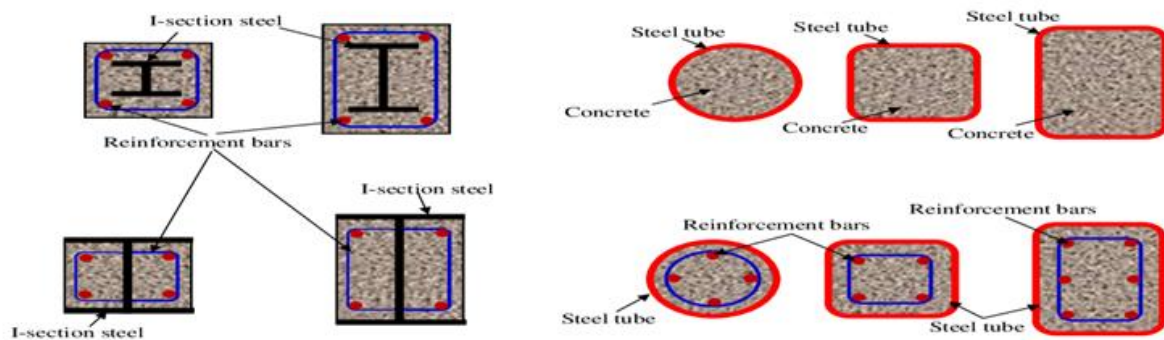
a) Concrete Encased Steel (CES) Columns; (b) Concrete-filled Steel Tubular (CFST) Columns
